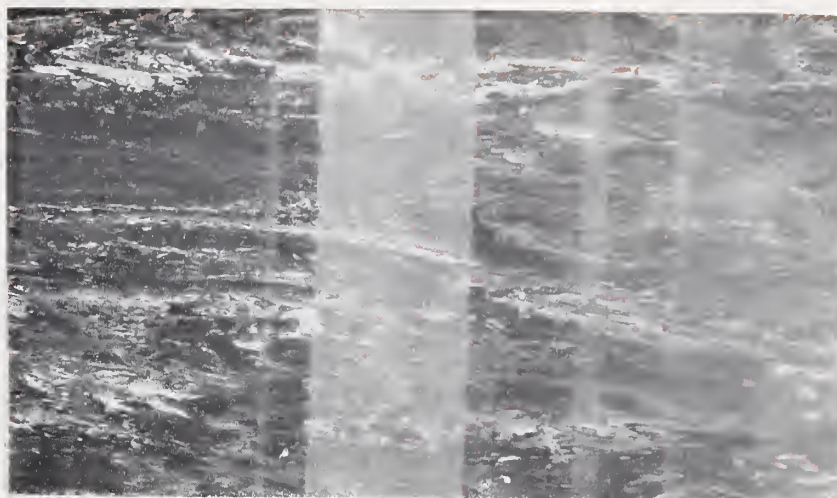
$\frac{1}{8}$ -in. sheet rubber on wood subfloor (test panel 4R).
